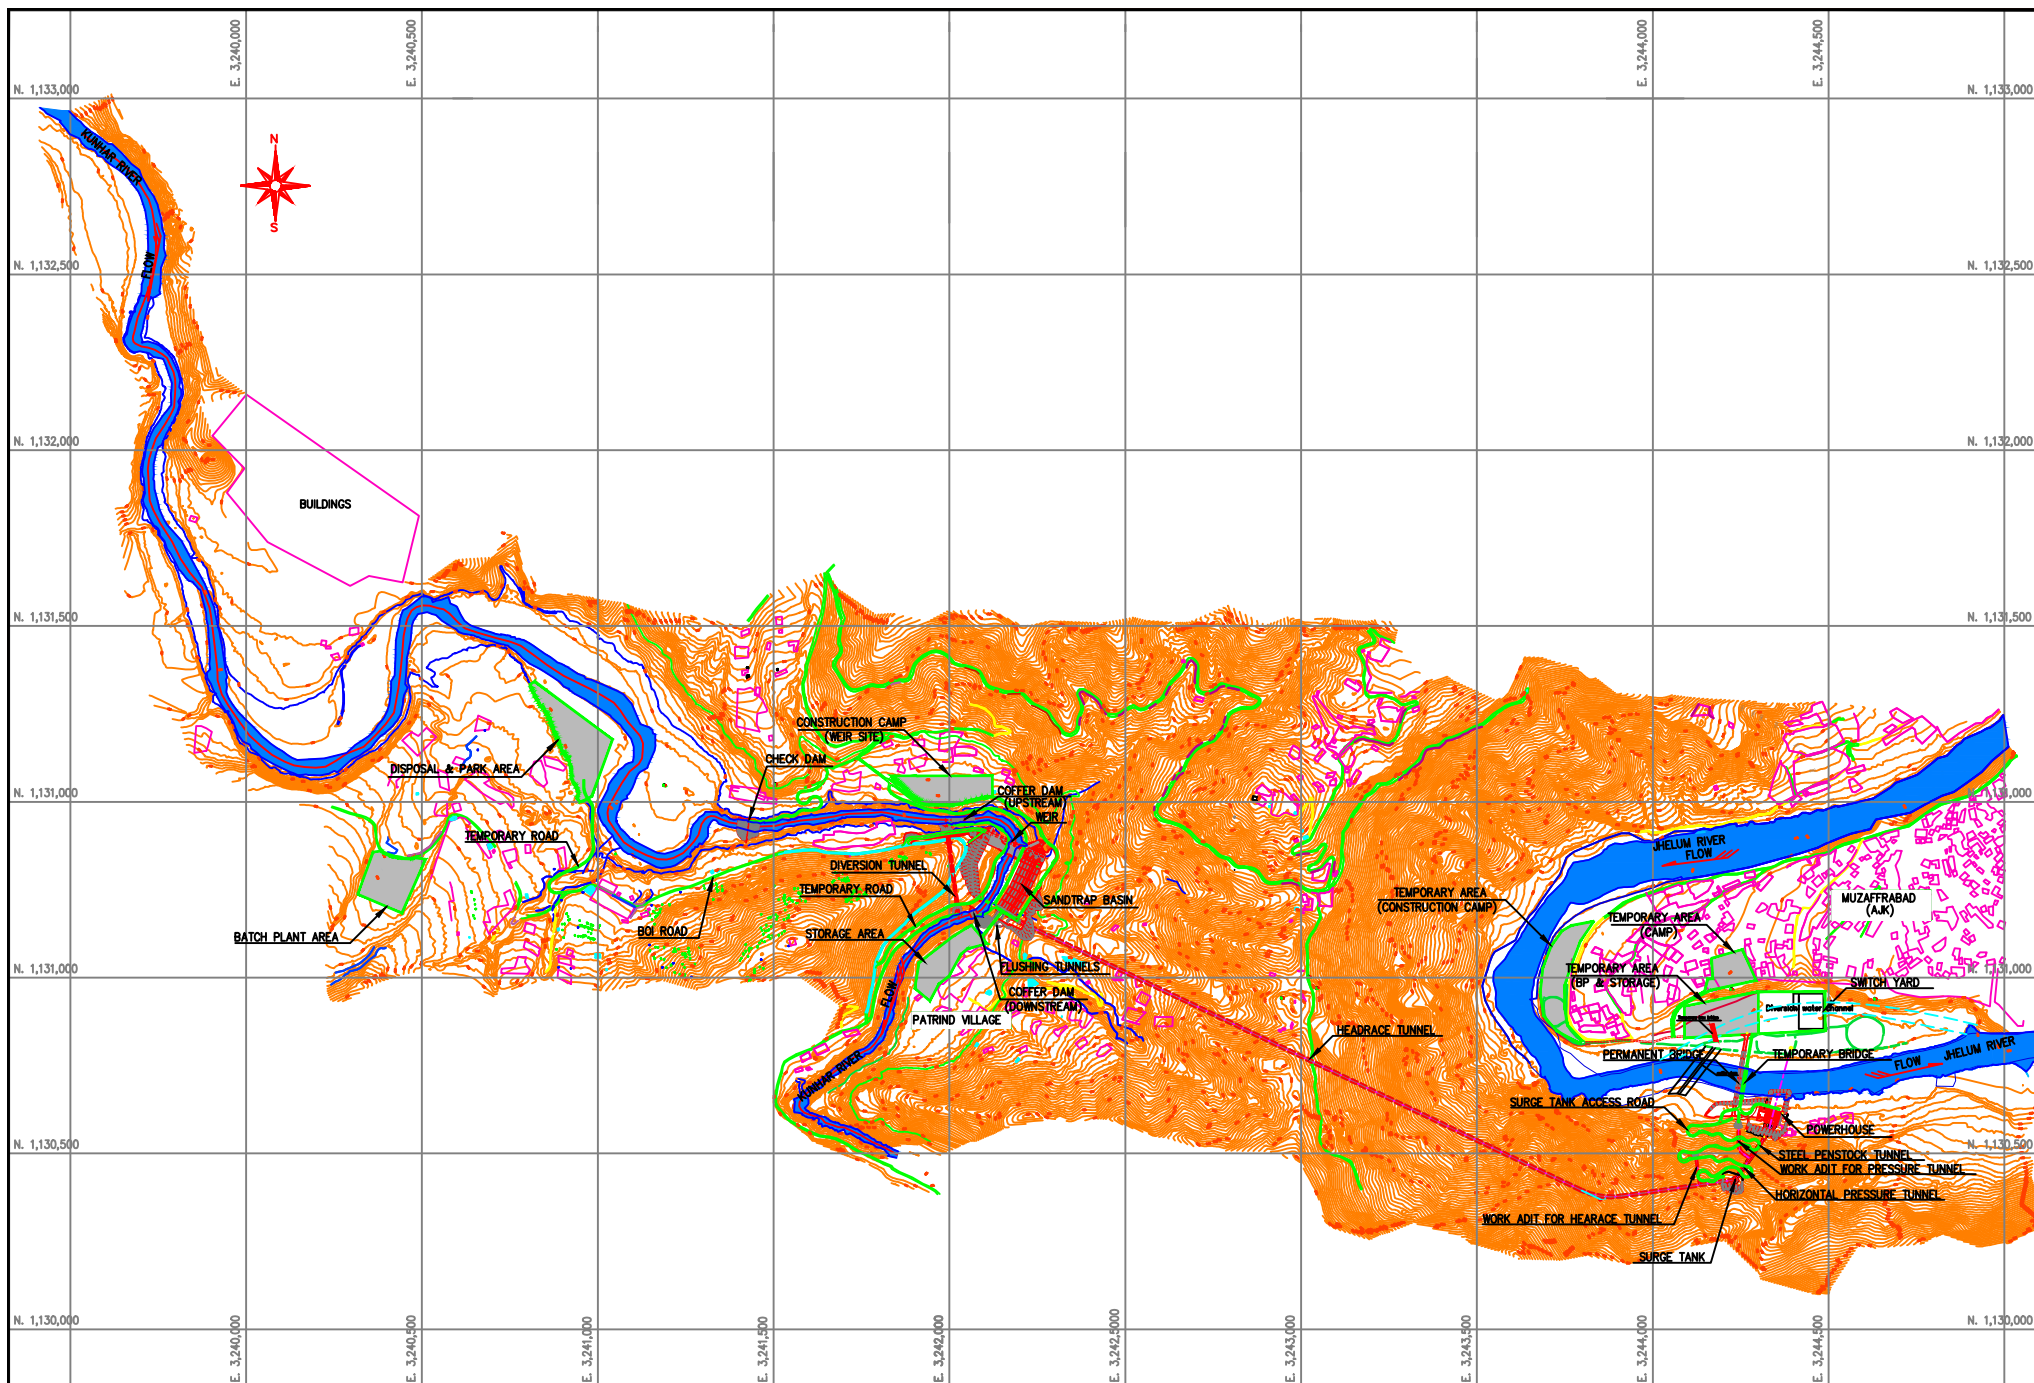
Location of Construction Camp and Storage Areas at Weir Site and Powerhouse Site
